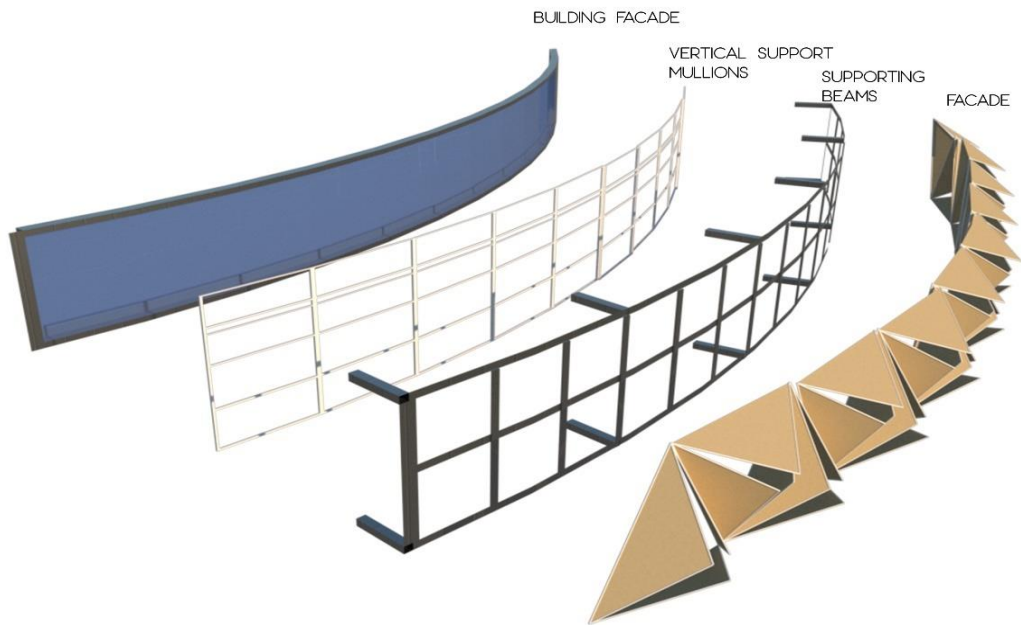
AXIOMETRIC VIEW OF FACADE INSTALLATION
